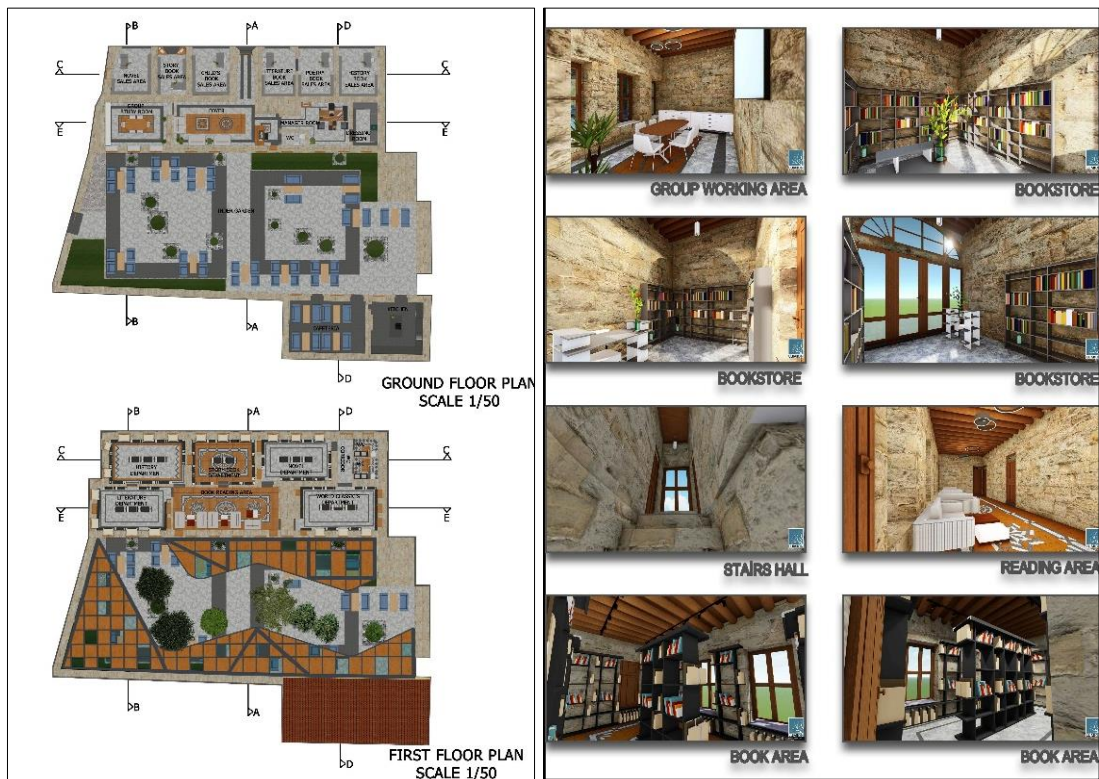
Proposal 3- book store&cafe- (a) plans (b) 3d views
